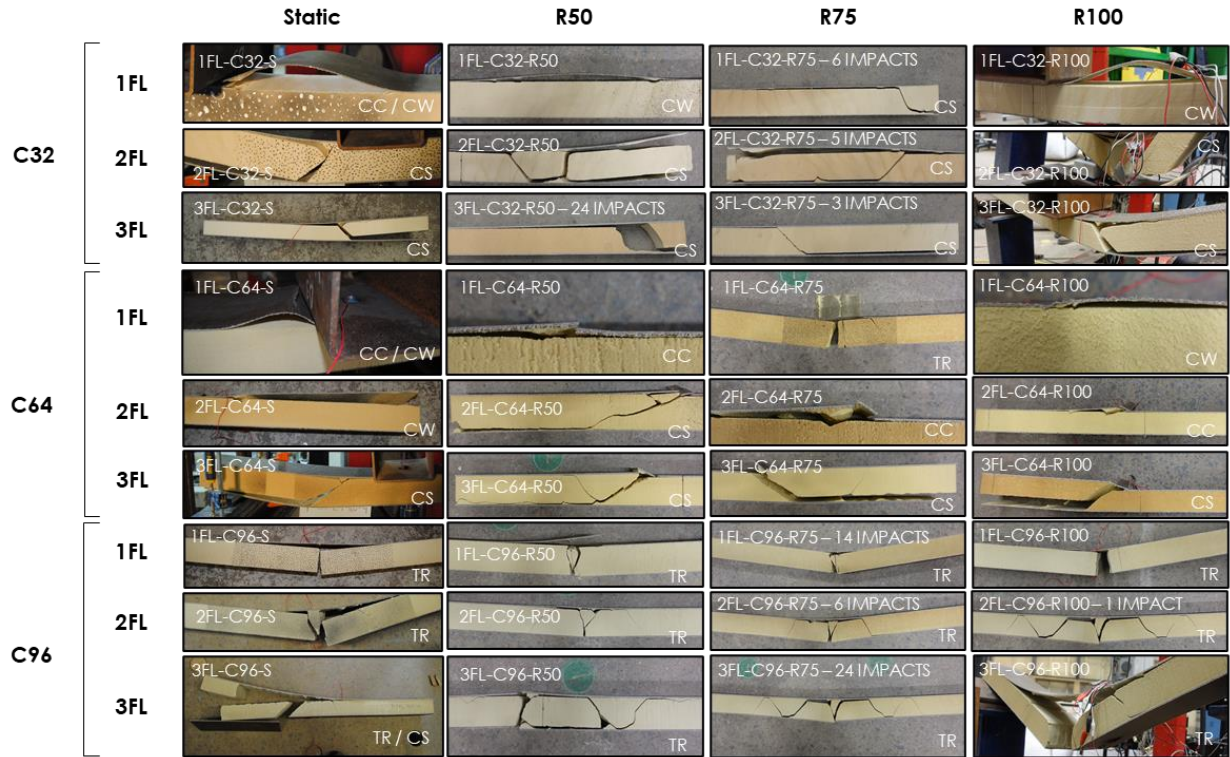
Failure modes of all specimens [Note static specimens were tested as a part of another study by Betts et al (2018)]
